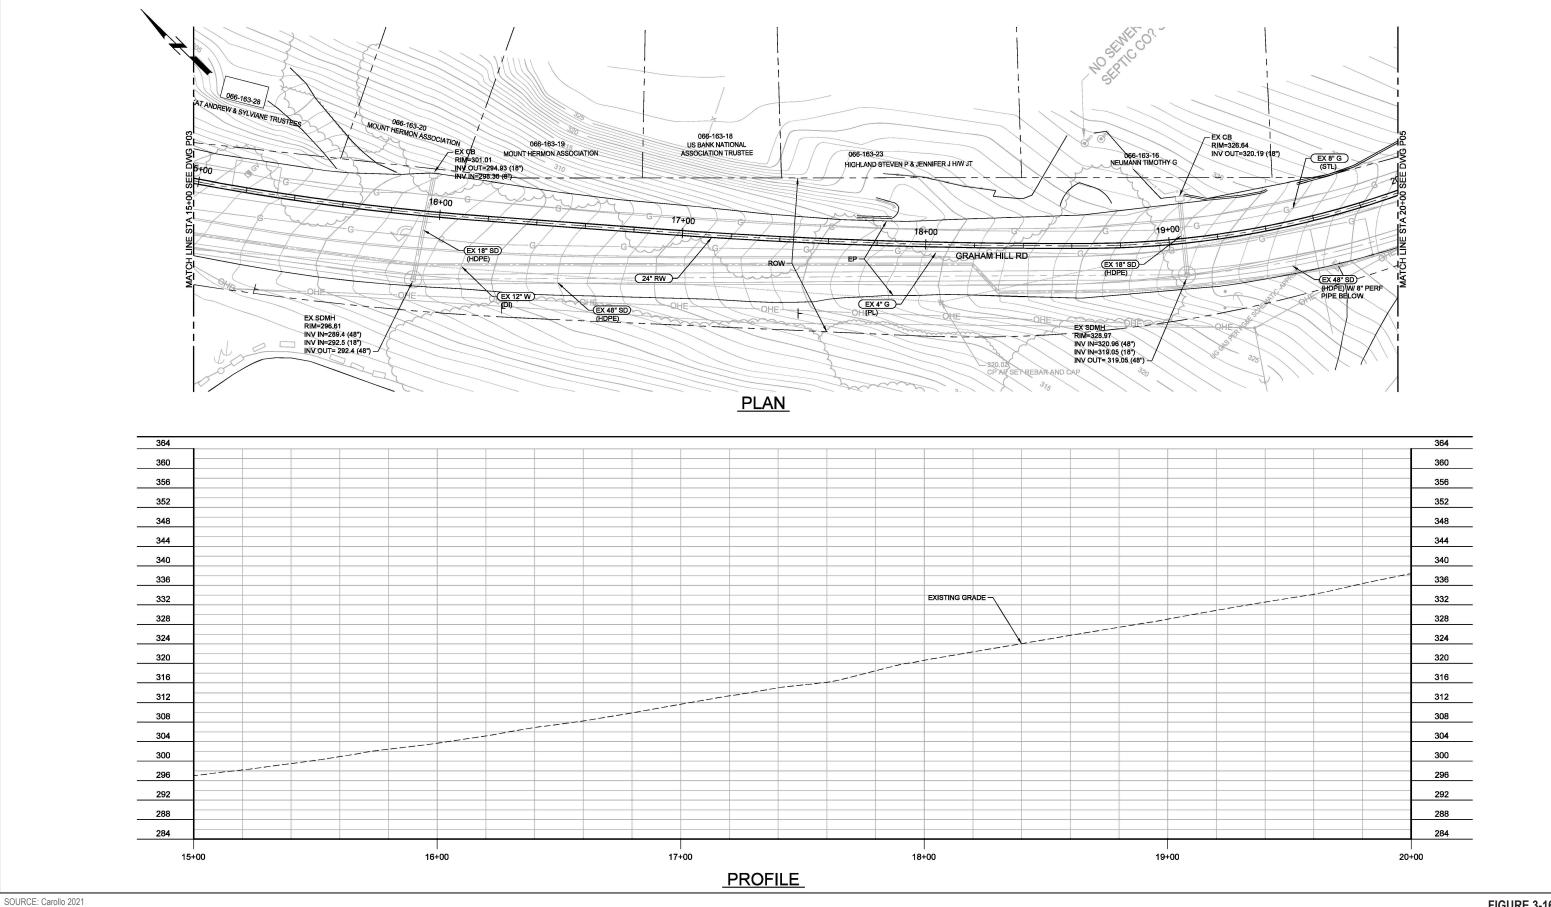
Graham Hill Road North Pipeline Section Site Plan - City Easement Area Newell Creek Pipeline Improvement Project
